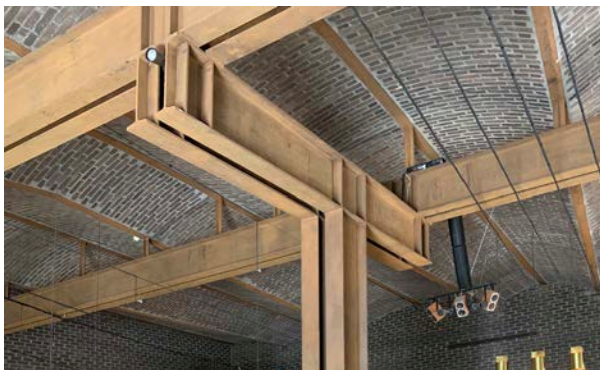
Sigurd Lewerentz, double beams and vaulted ceiling, St. Peter's Church in Klippan, 1963-66
